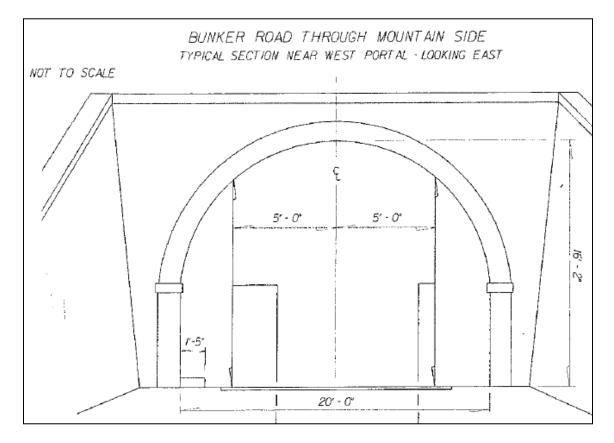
Tunnel cross-section (Image credit: FLH)
